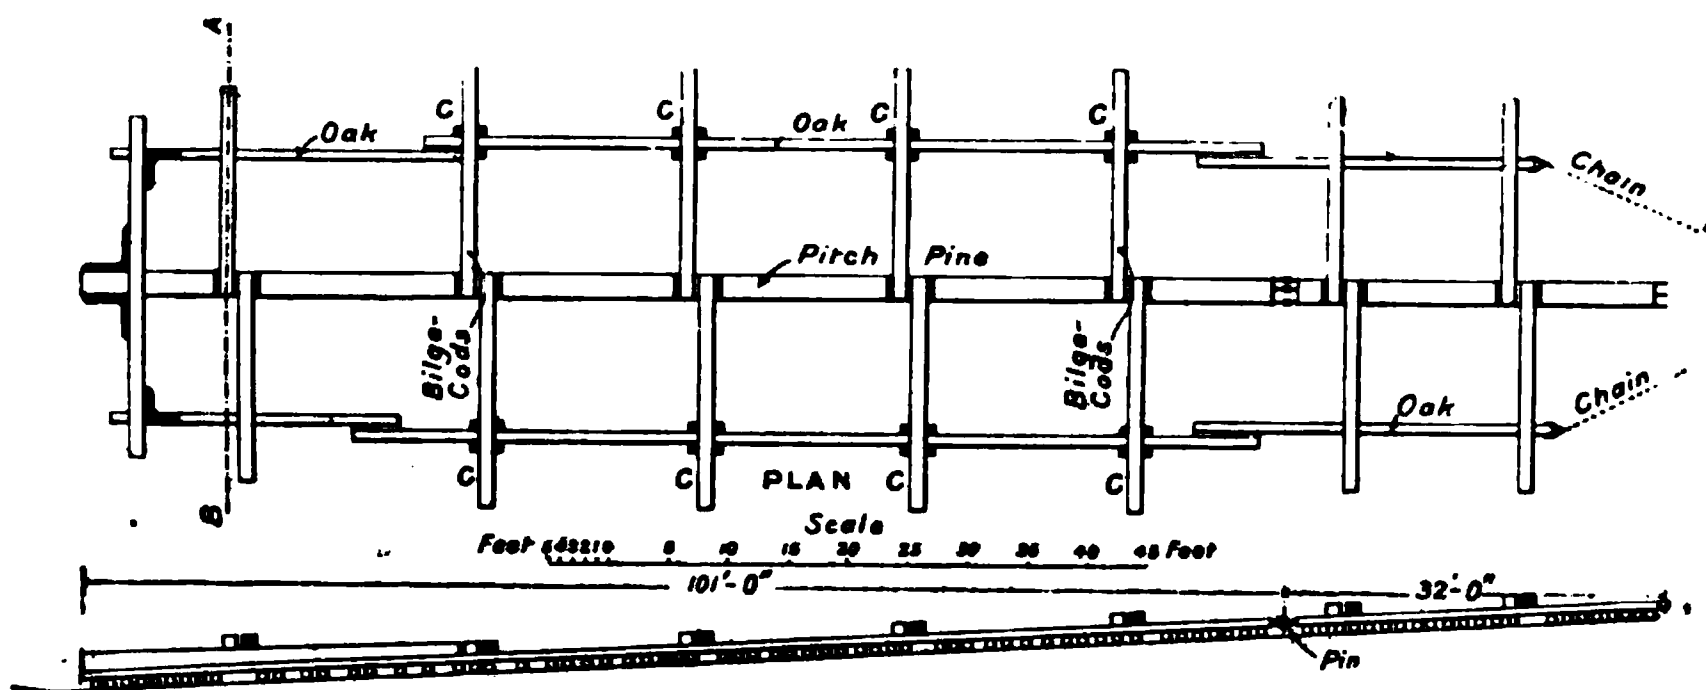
and 485.—Plan and Elevation of Slipway at Dover.
